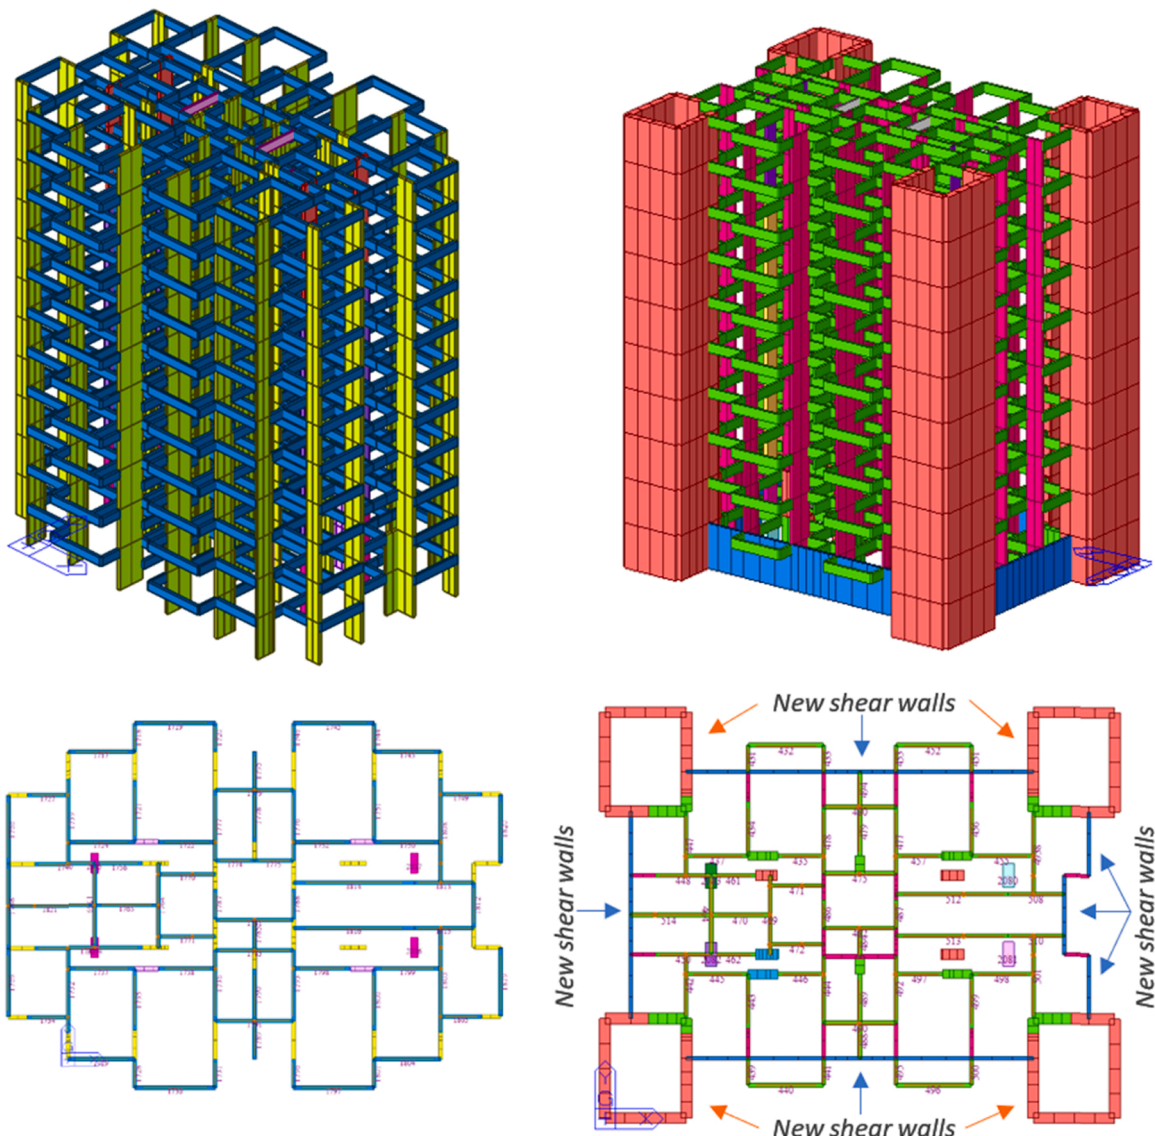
Three-dimensional finite element model of Building A (left) and Building C (right).
